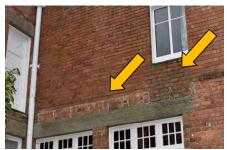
Infilled original doorway with amended opening dimensions (right arrow) and brick infill of pockets (left arrow) where the balcony structure was embedded into the south elevation.
